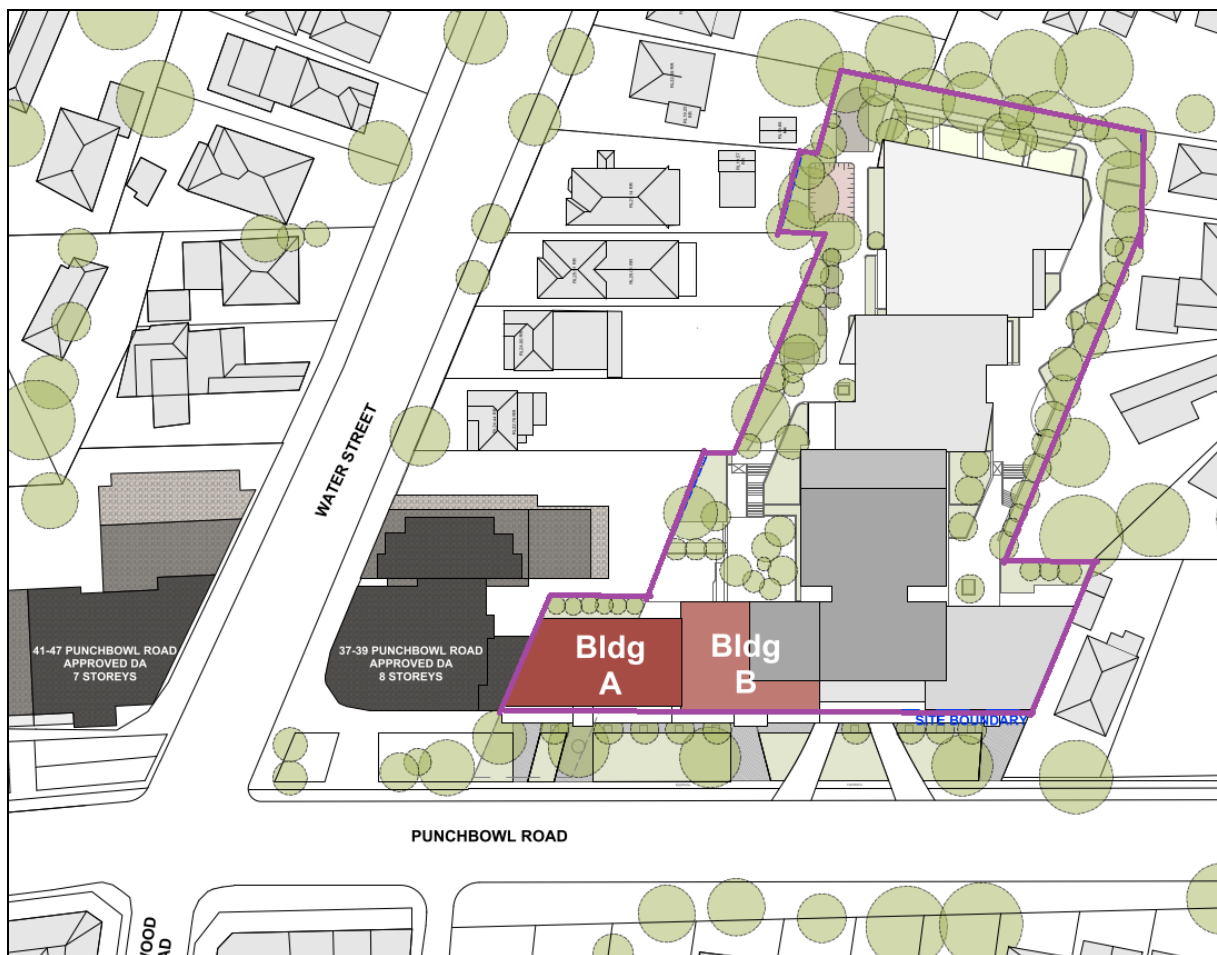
Site plan showing the location of Building A and Building B on the subject site.
